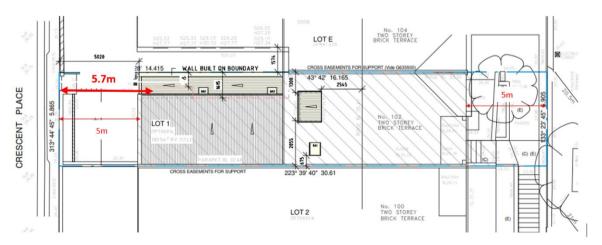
Annotated Site Plan (D.A - 100 Issue A)
